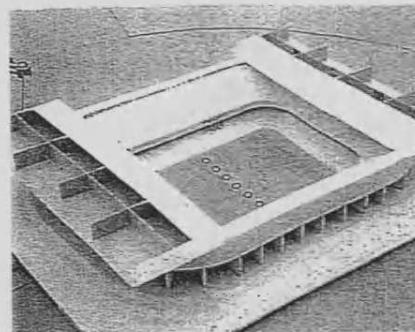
(R3) Asymmetrical Retractable roof. [Deep Structure]
